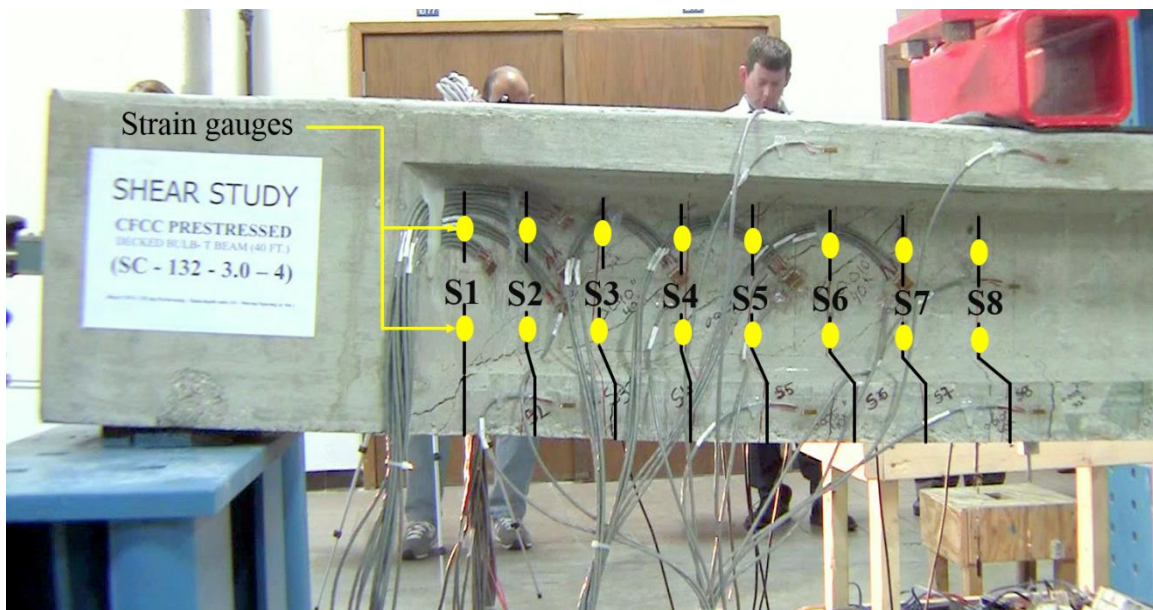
Location of internal strain gauges on CFCC stirrups of Beam C-C-S-B
